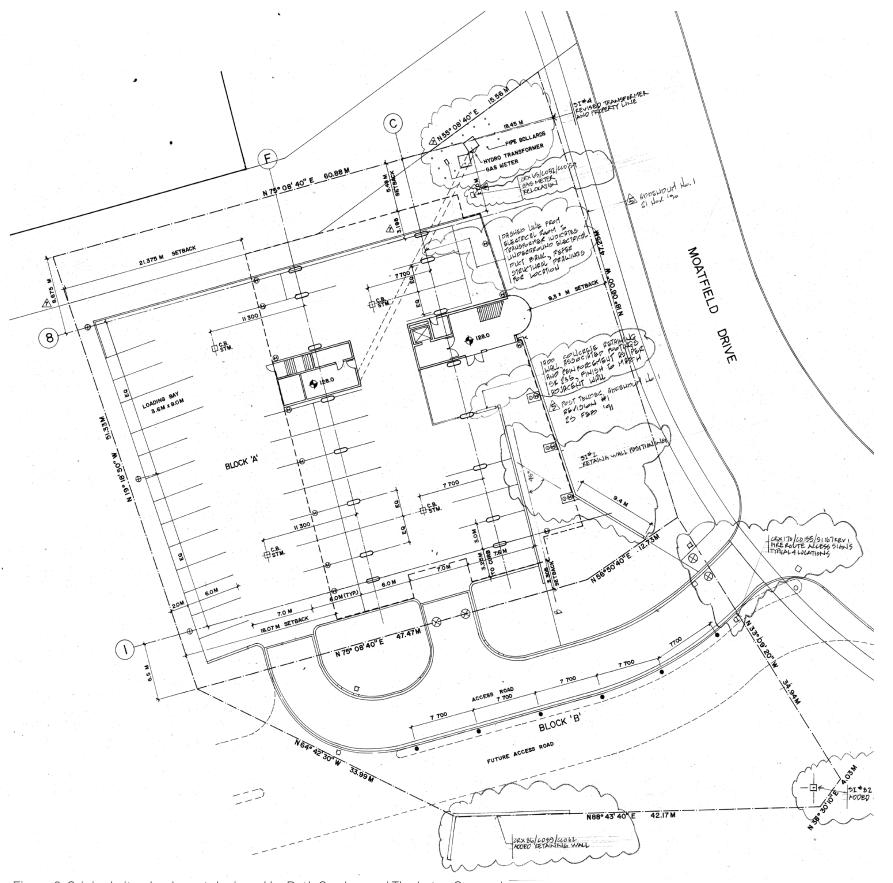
Original site plan layout designed by Ruth Cawker and The Lotus Groups Inc.
